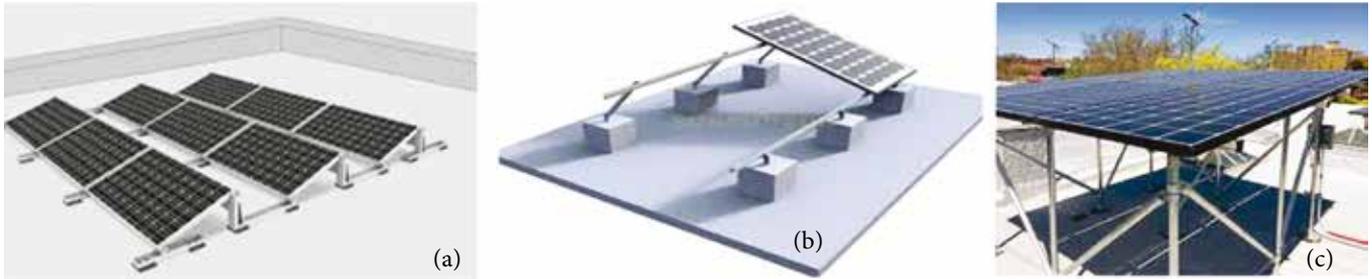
(a) Panels mounted on frames fixed directly on the roof; (b) Panel frames mounted on concrete pedestals; (c) Panels mounted on frames to get a shade-free area for SPV
